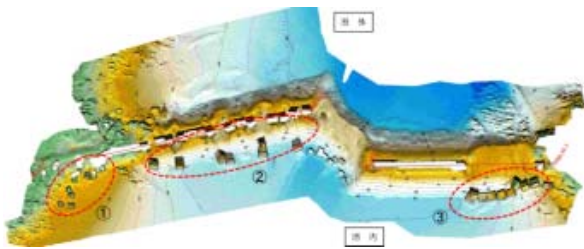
Tsunami-distributed caissons of breakwater in Kamaishi Port, (1): Shallow water section of the North Breakwater, (2): Deep water section of the North Breakwater, and (3): Shallow water section of the South Breakwater
